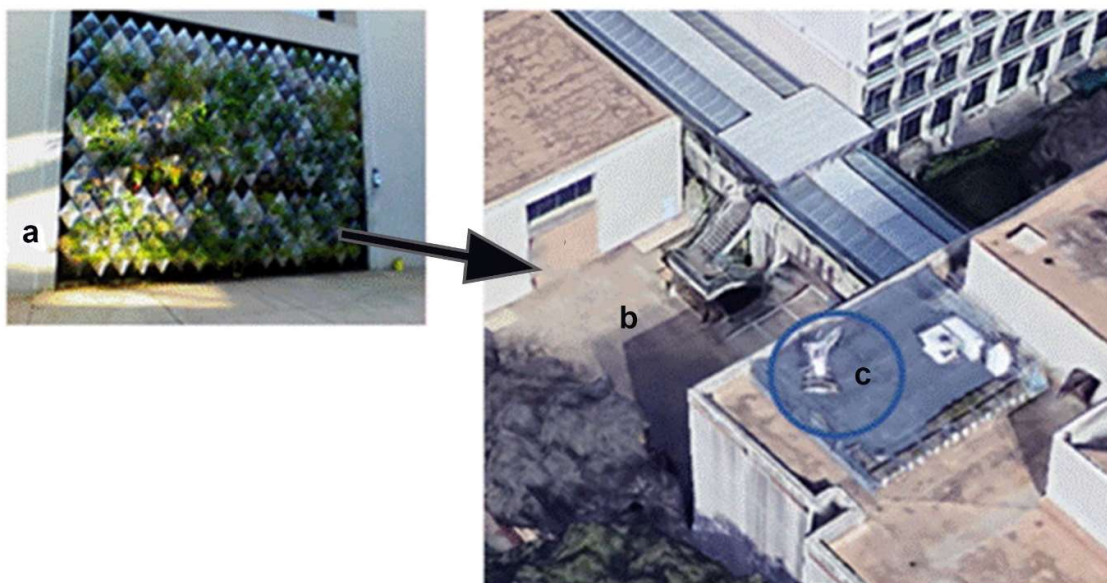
Overall view of the modular living wall; (a) installed in front of the pre-existing brick wall (arrow). Adjacent concrete courtyard (b) and weather station location (c) on the opposite building; b and c in Google Earth image, camera: 172 m, 30°37'09" N 96°20'18" W 109 m. Access year: 2017.
